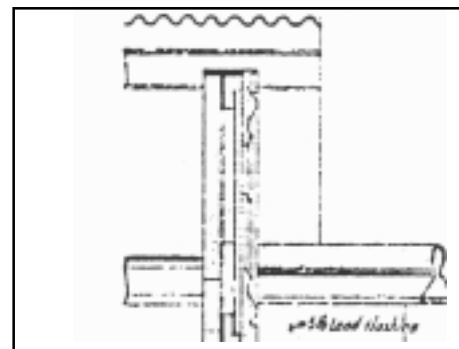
Roof section showing the end of the roof lantern with moulded timber detailing. Source: SRAO ELW5.
